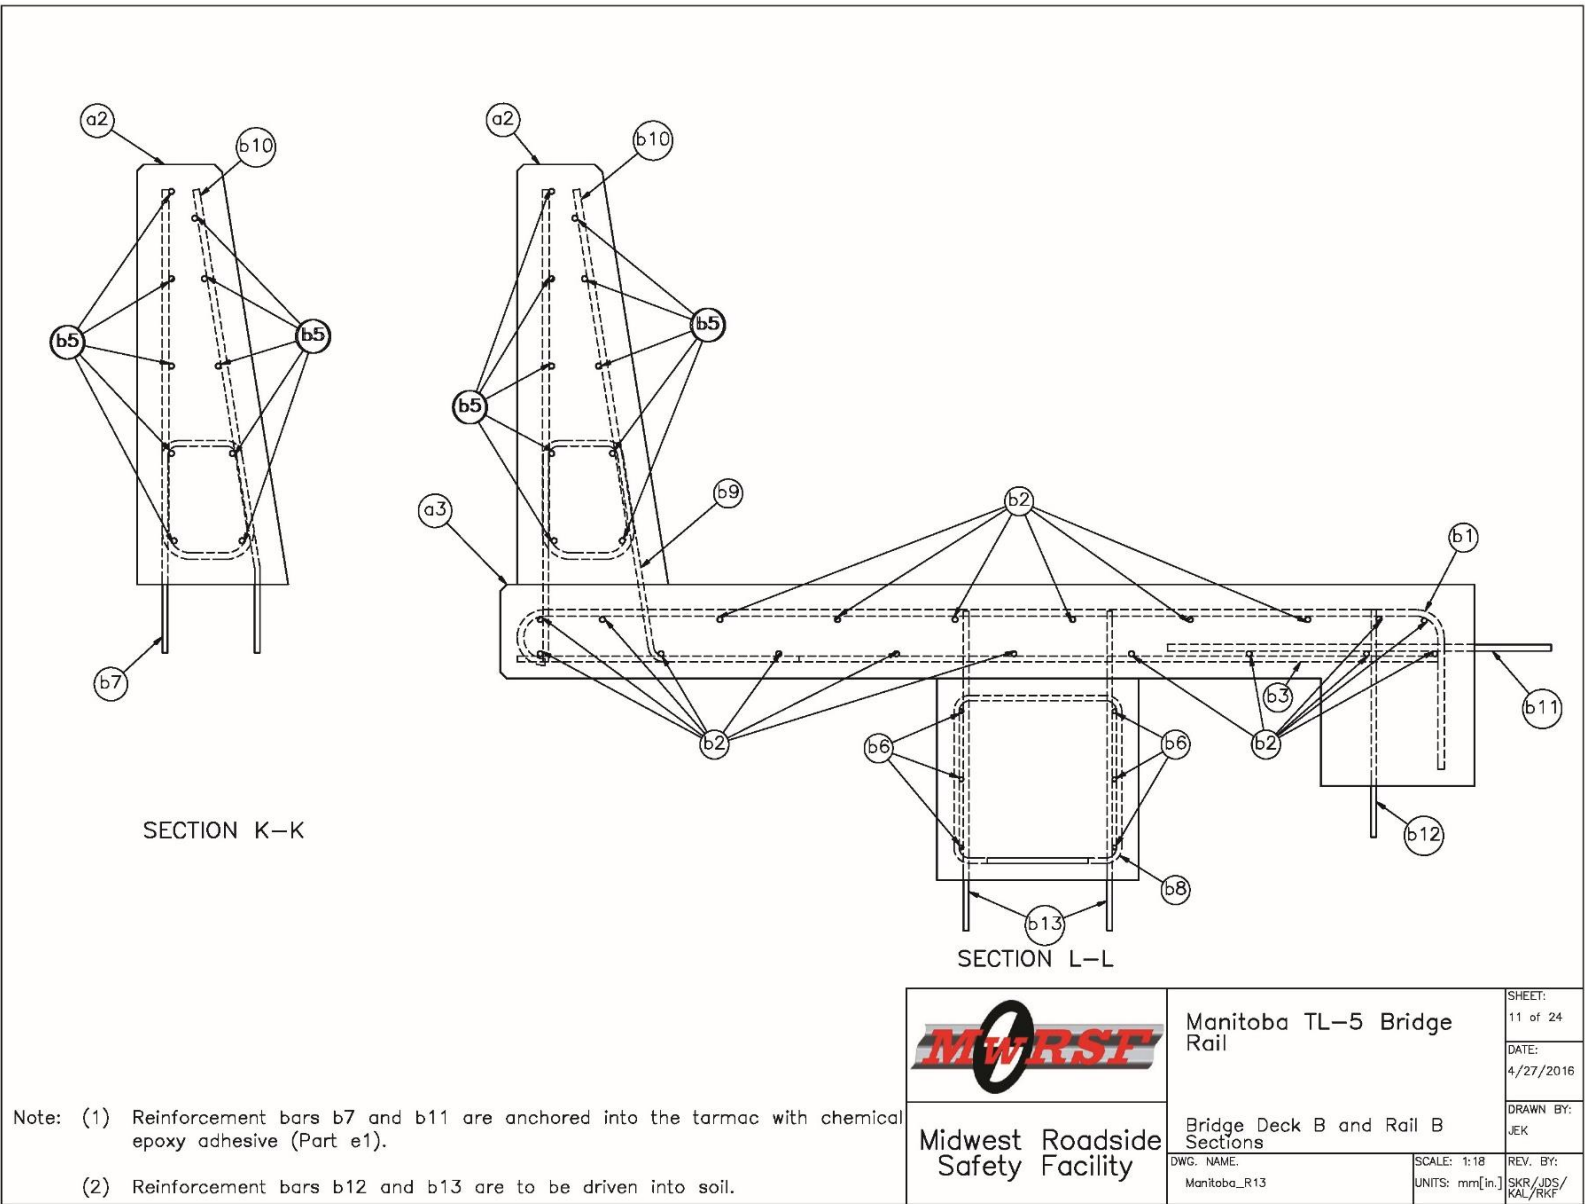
Bridge Deck B and Rail B Sections, Test No. MAN-1
